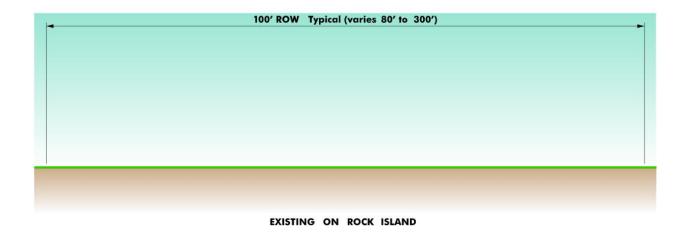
Bus Rapid Transit Rock Island Railroad Typical Section, Existing Conditions
